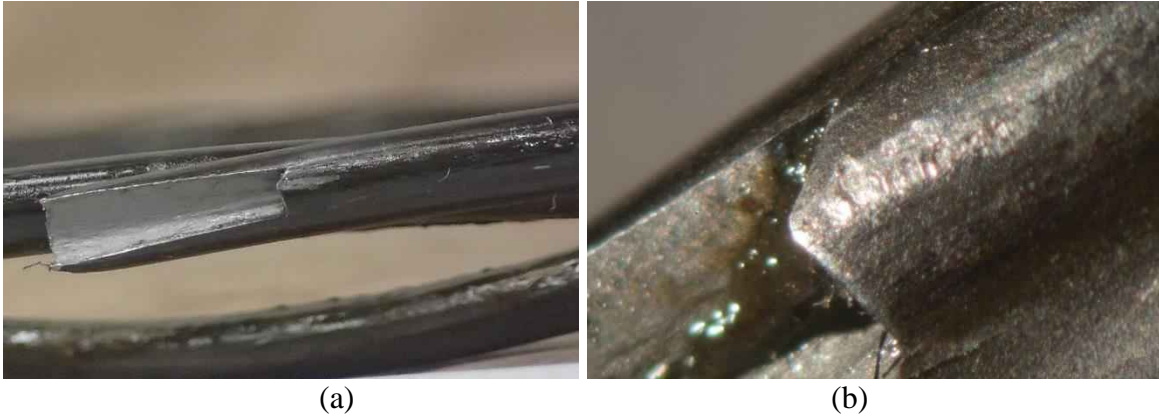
Specimen F2 strand brittle failure (a) fretting fatigue (b) close-up of fracture due to fretting
